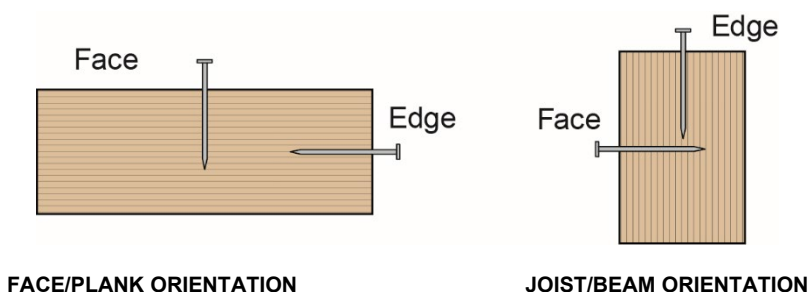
FACE AND EDGE NAILING EXAMPLES
